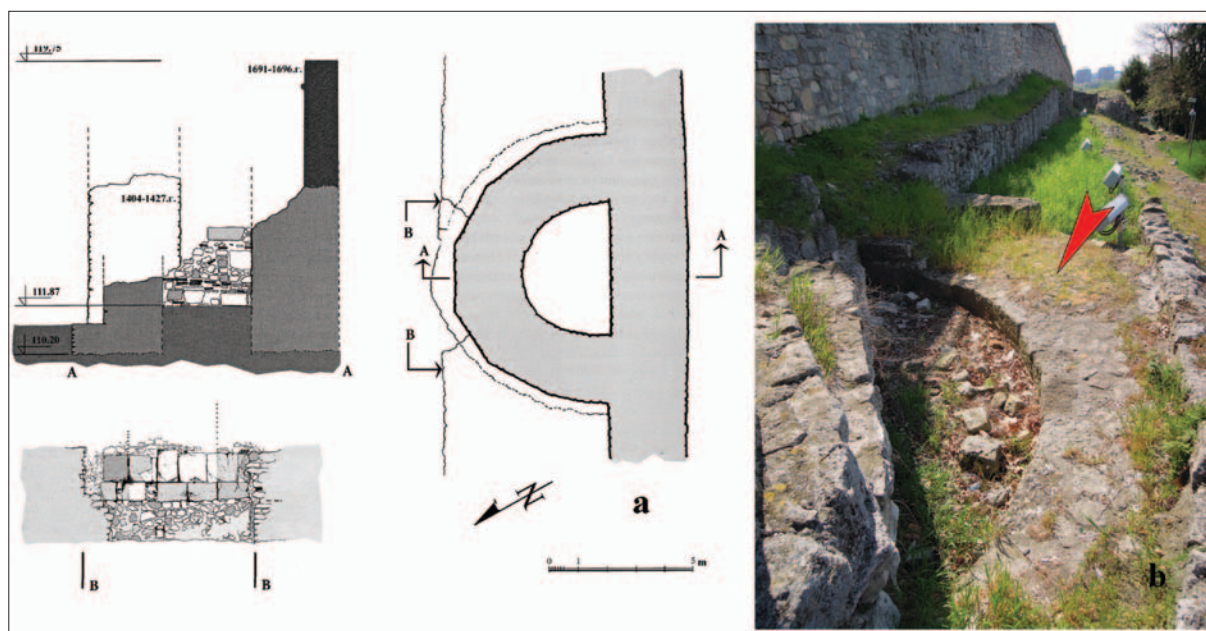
Belgrade, Byzantine castle, remains of a tower on the northwestern rampart; a. plan with elevation and section (Поповић 2006: 64); b. (photo by: D. Radičević)
